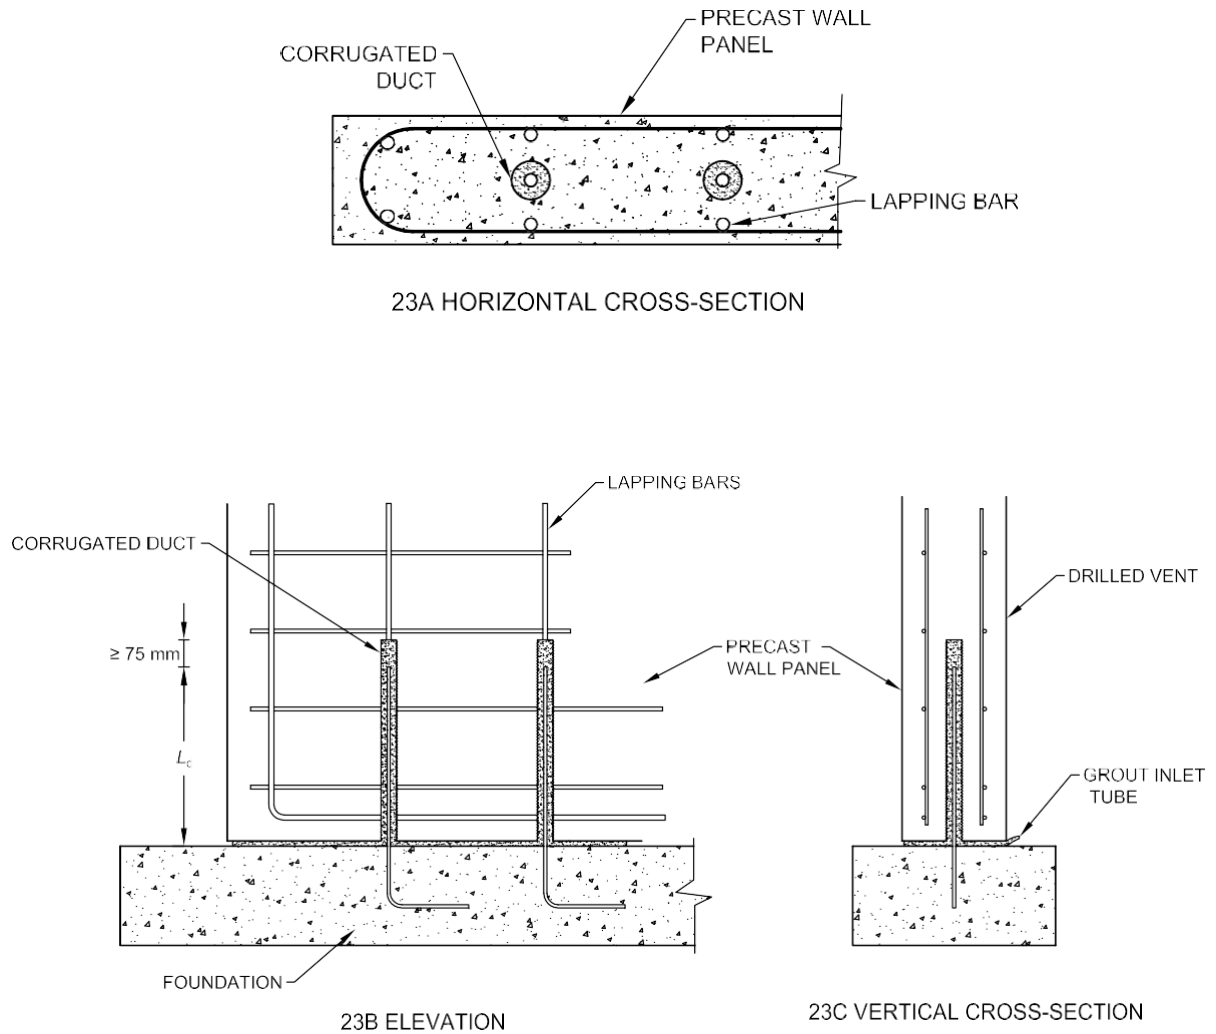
WALL TO FOUNDATION CONNECTION THROUGH GROUTED DUCT
